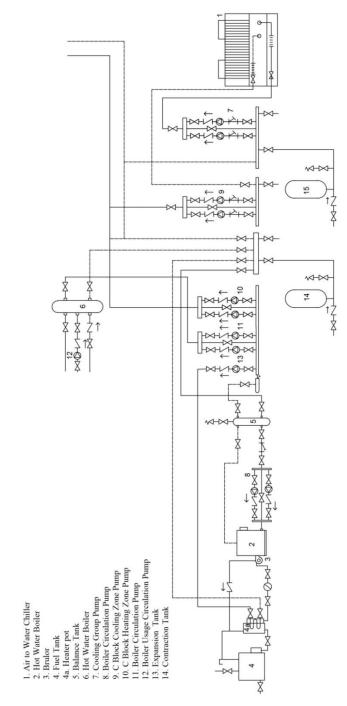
HVAC and Domestic Hot Water System of the Case Study Building
